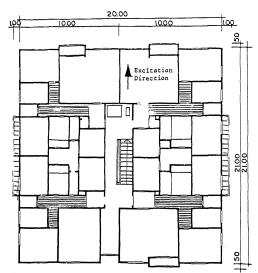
Typical Floor Plan for the 7-Story Structure
